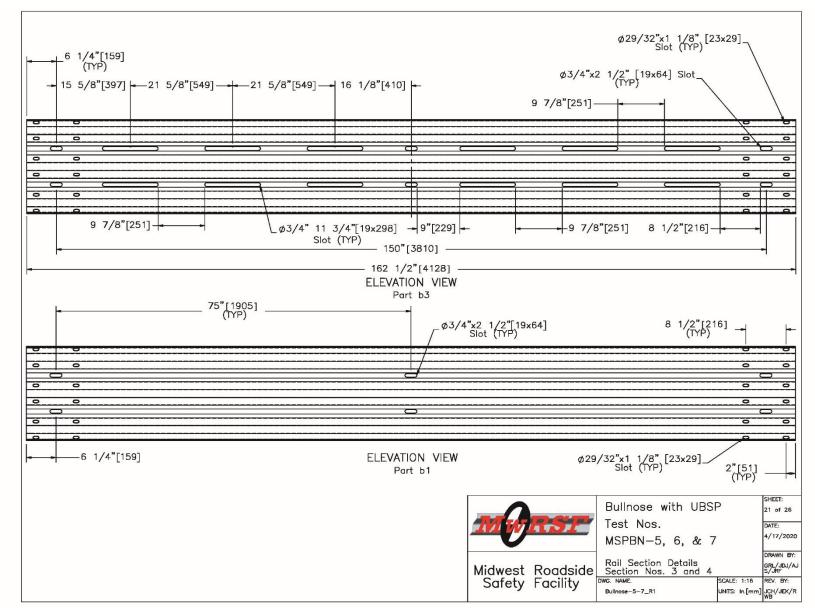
Rail Section Details Nos. 3 and 4, Test Nos. MSPBN-5 through MSPBN-7
